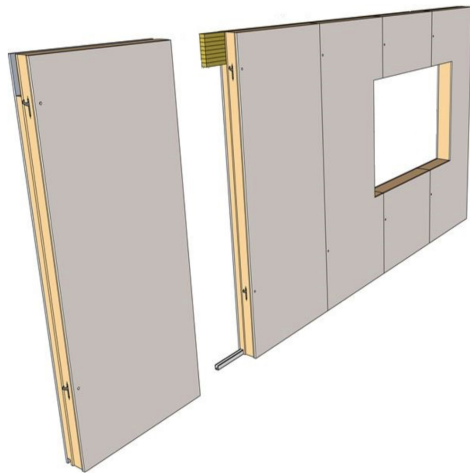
DC Thermopanel wall with glued laminated timber beam. [DC-System catalogue (2018)]
